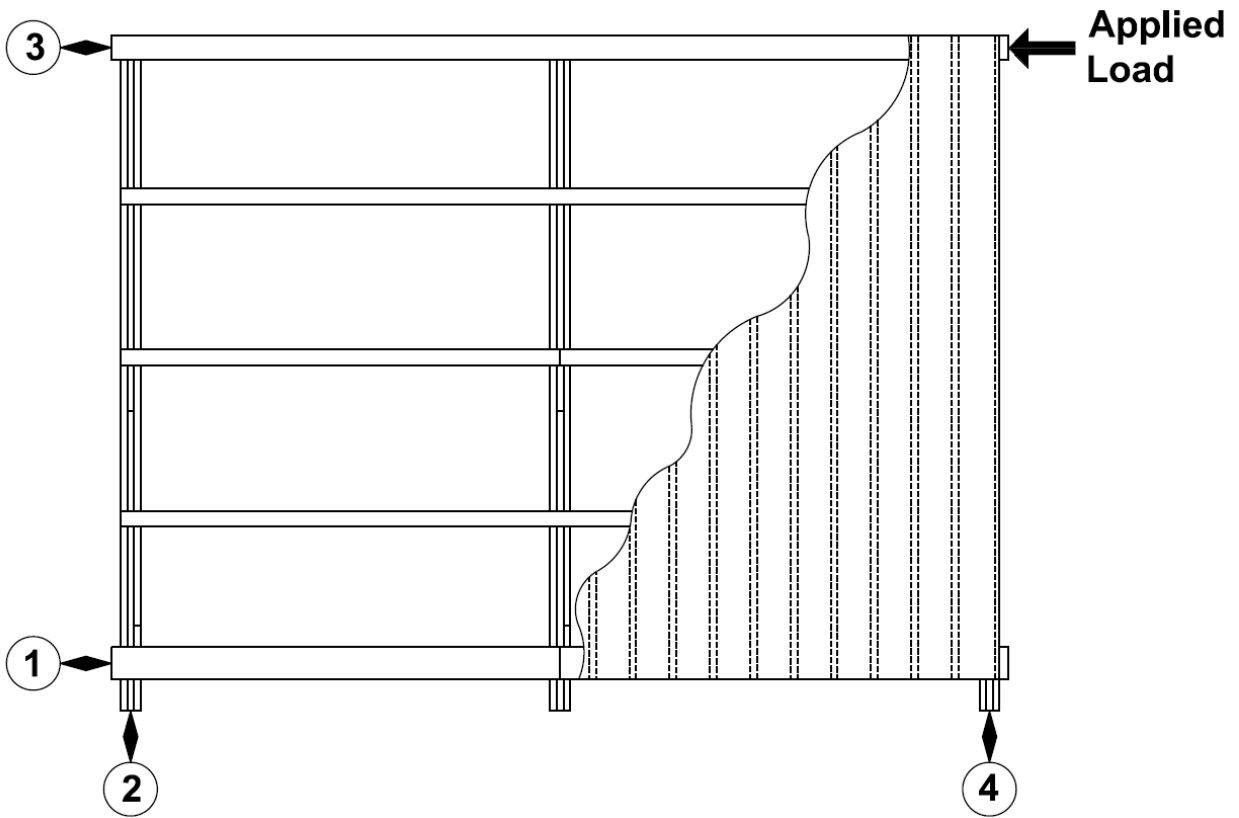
Location of string potentiometers for cantilever shear wall test
